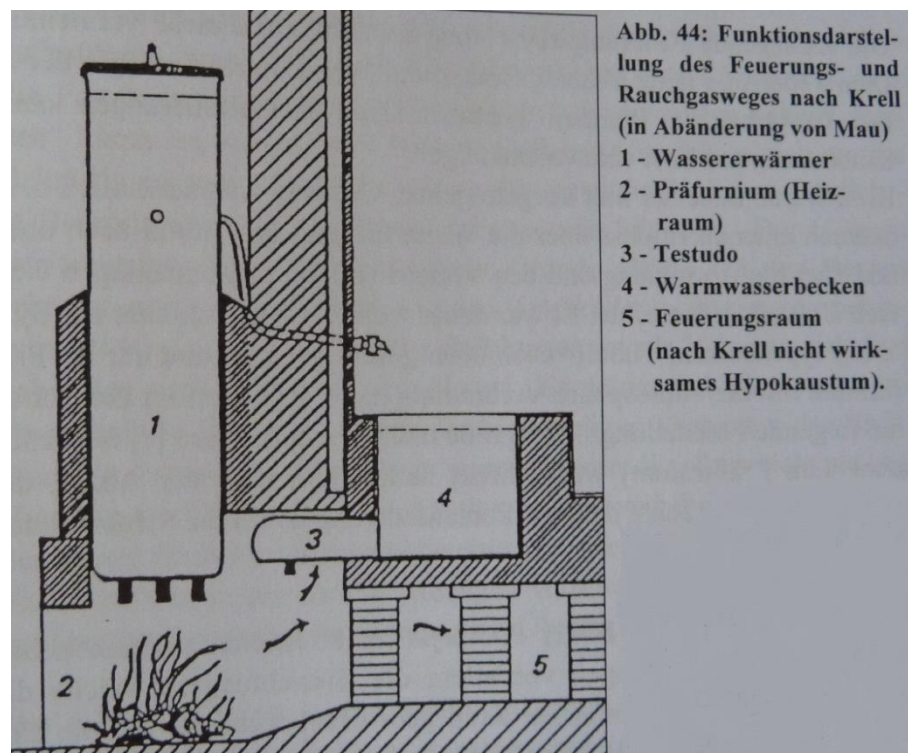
Drawing showing Furnace Heating Boiler, Water, and Hypocaust (Schiebold 2006, 69)
